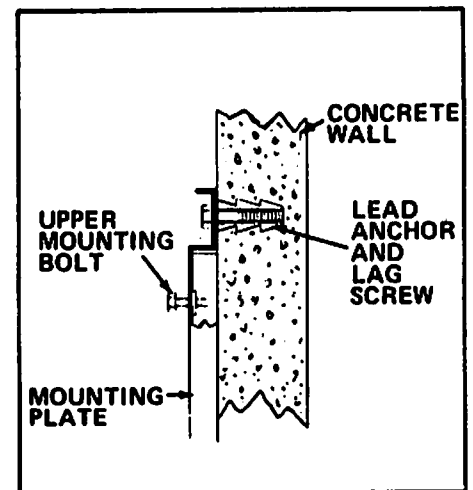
INSTALLING WALL MOUNTING PLATE
